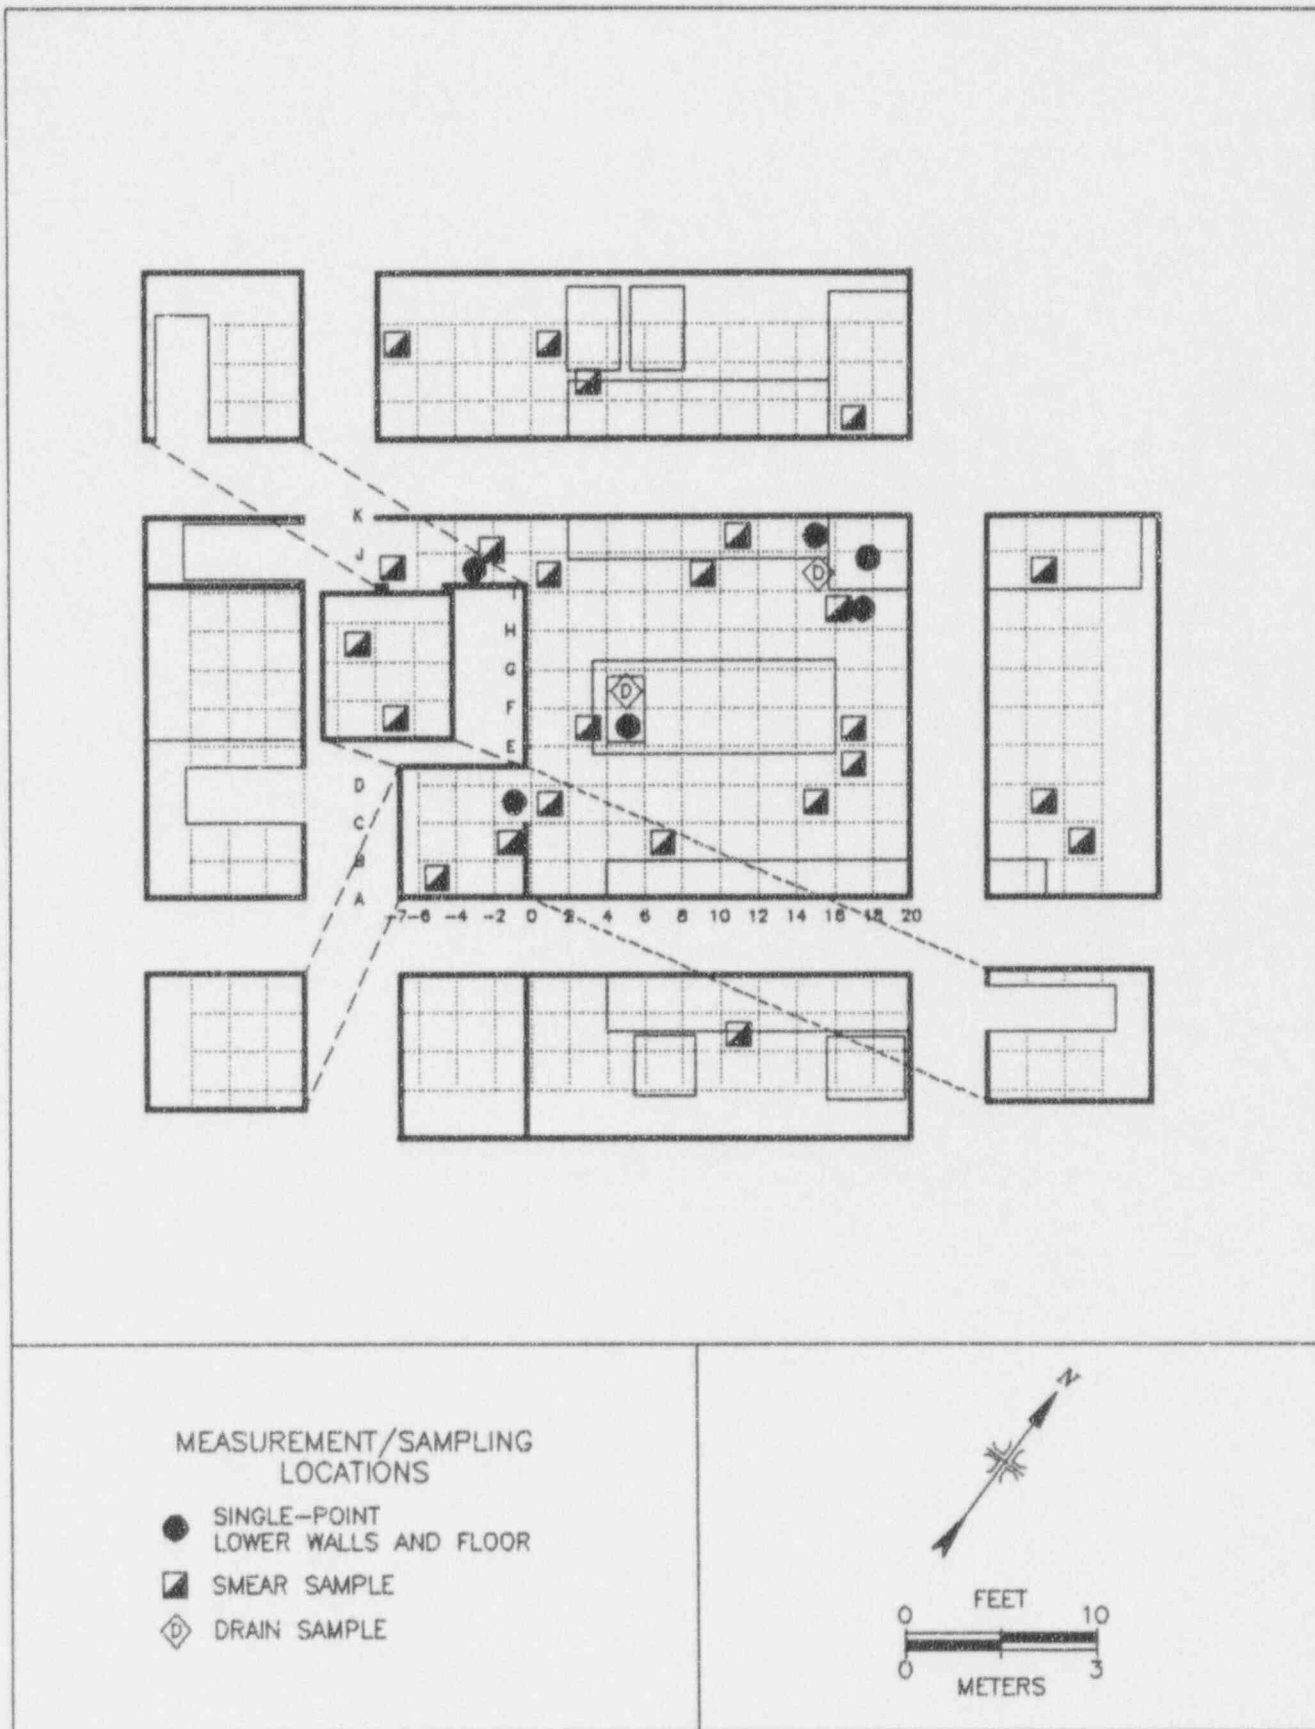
Building 19, Room 102 – Measurement and Sampling Locations
